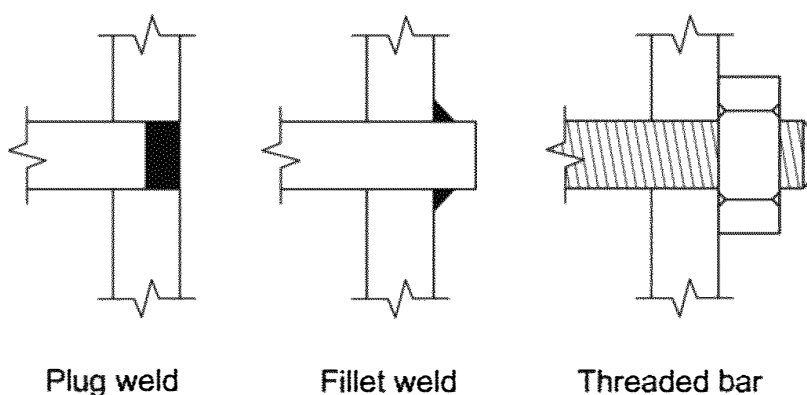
Examples of tie-to-plate connection detail.
